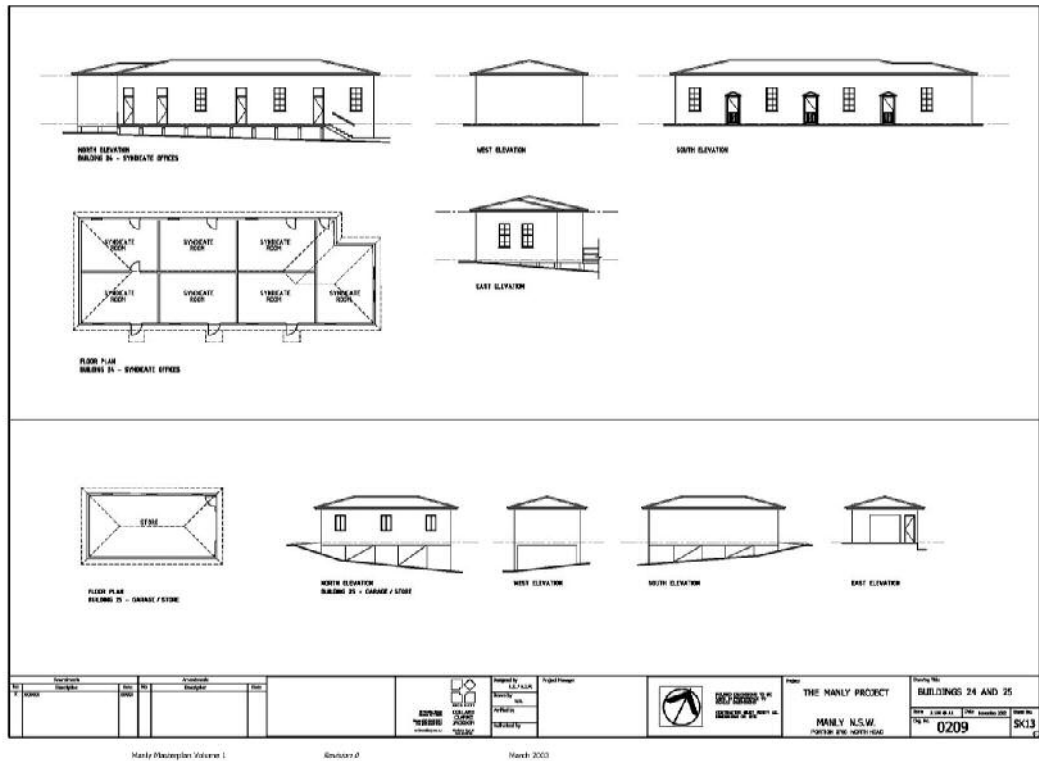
Drawing showing syndicate building and store. Collard Clarke Jackson Architects - March 2003.
